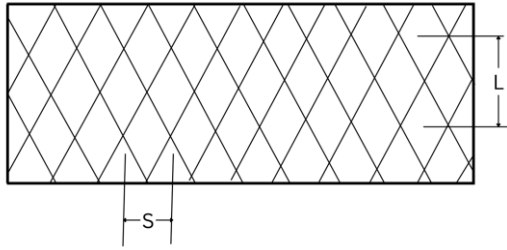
Expanded metal mesh wire (drawn after [90]).
